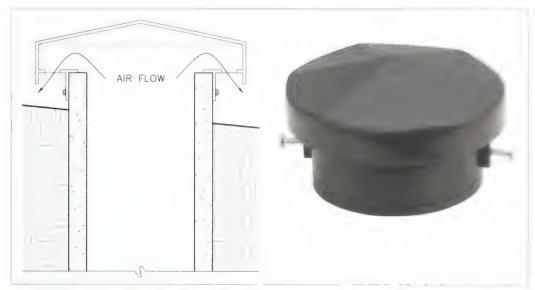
Installation of cap over concrete pipe and ABS plastic ventilation cap. The top of the cap should be pitched to prevent water and ice from building up. It should also be vented to allow air flow (Olmsted Center and http://www.toolstation.com/images/library/stock/webbig/22205.jpg).
